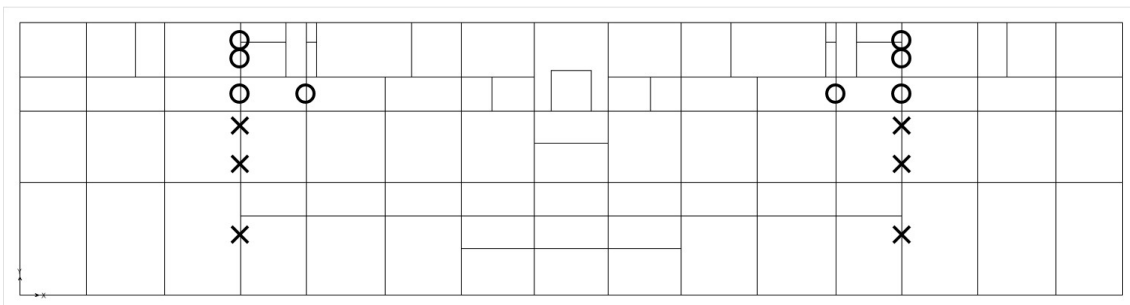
Damper Placement at 4th floor (SR-Y); MSSSA: 8 dampers;
